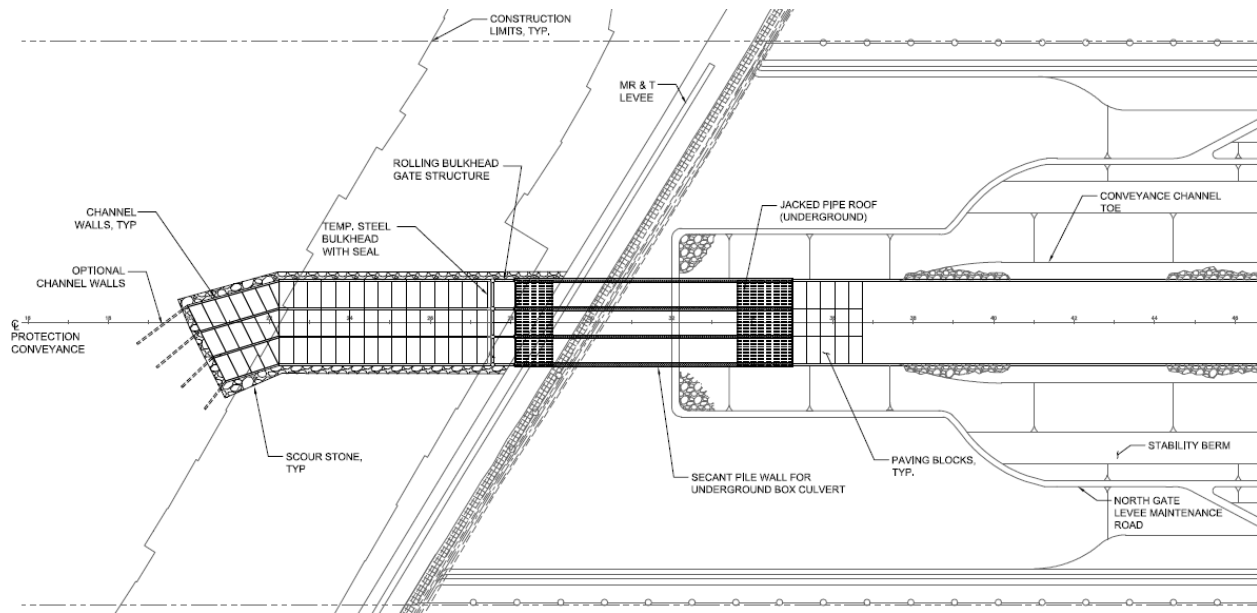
Alt. C – Alternate Plan View of the Inlet/Approach Channel, Control Structure, Submerged Box Culverts & Transition to the Conveyance Channel
